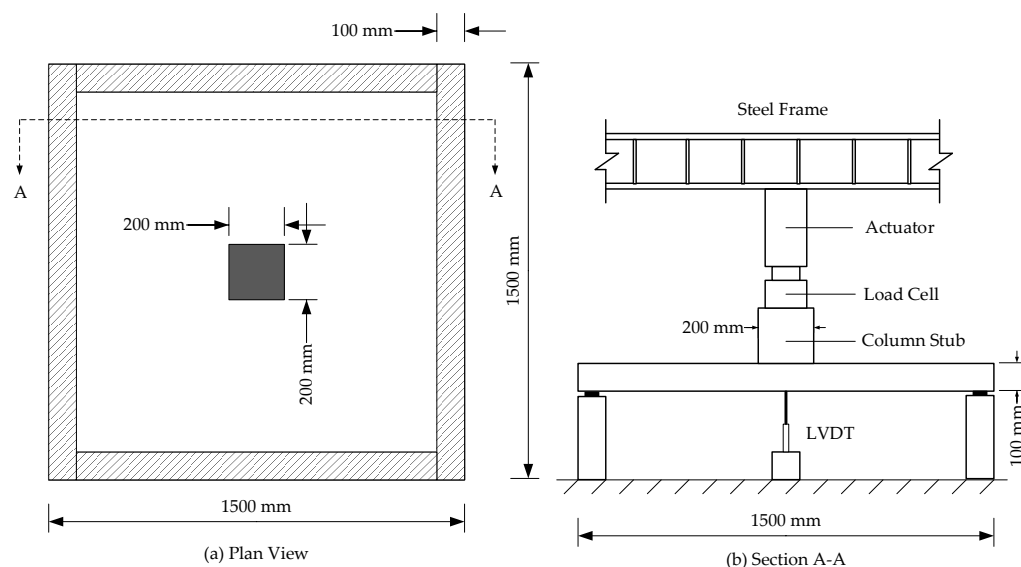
Dimensions of slabs: (a) plan view; (b) test setup.
